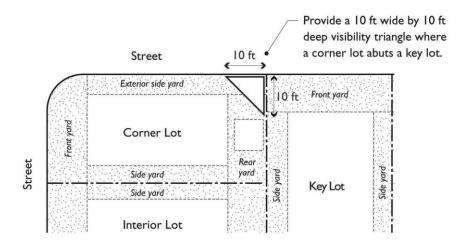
D CORNER LOT ABUTTING A KEY LOT
